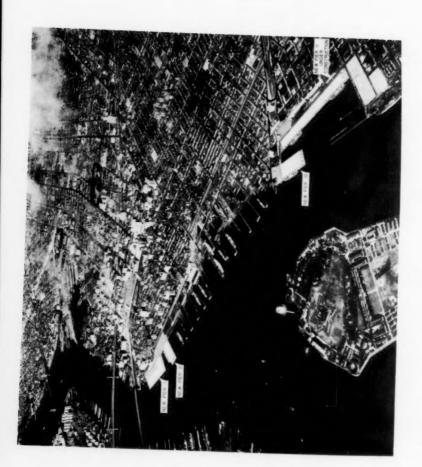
Brooklyn - P. A. Piers - Aerial View Showing Piers now under Construction
